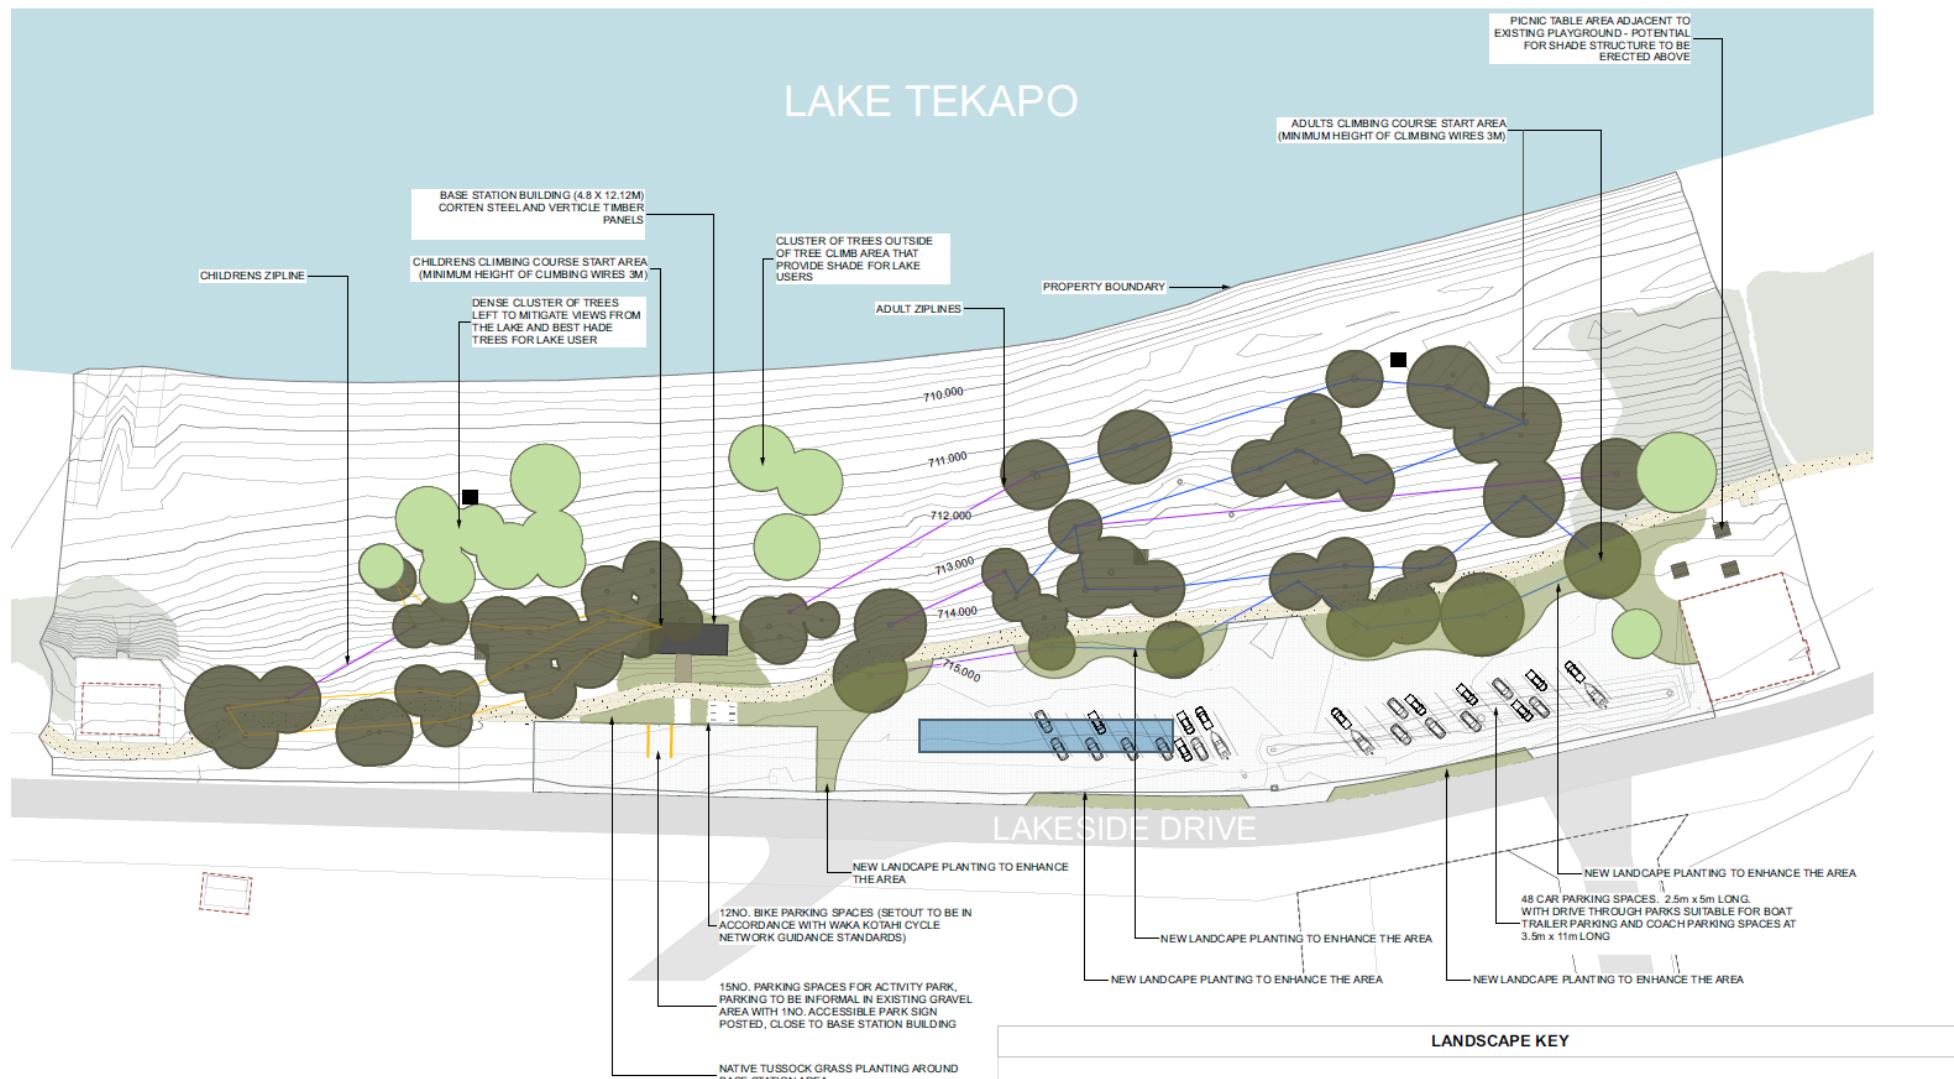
Layout of the proposed ropes course – provided by way of background information only
